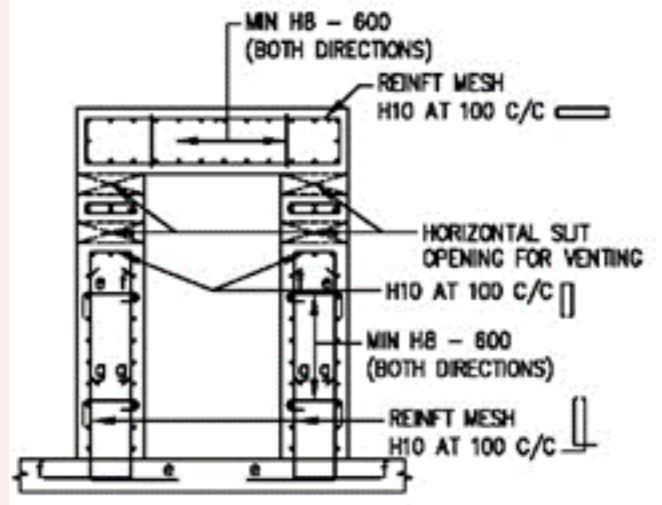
(b): REINFORCEMENT DETAILS OF RC STRUCTURES ABOVE ROOF LEVEL FOR GAS RISER WITHIN SS SETBACK DISTANCE (OPENING WIDTH \leq 100MM)
